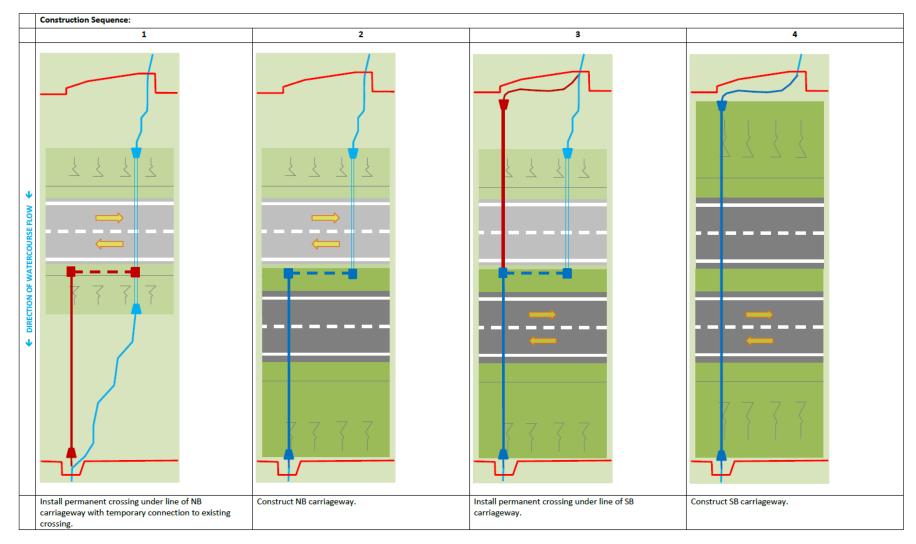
Widening to the west – road on embankment – off-line watercourse alignment
